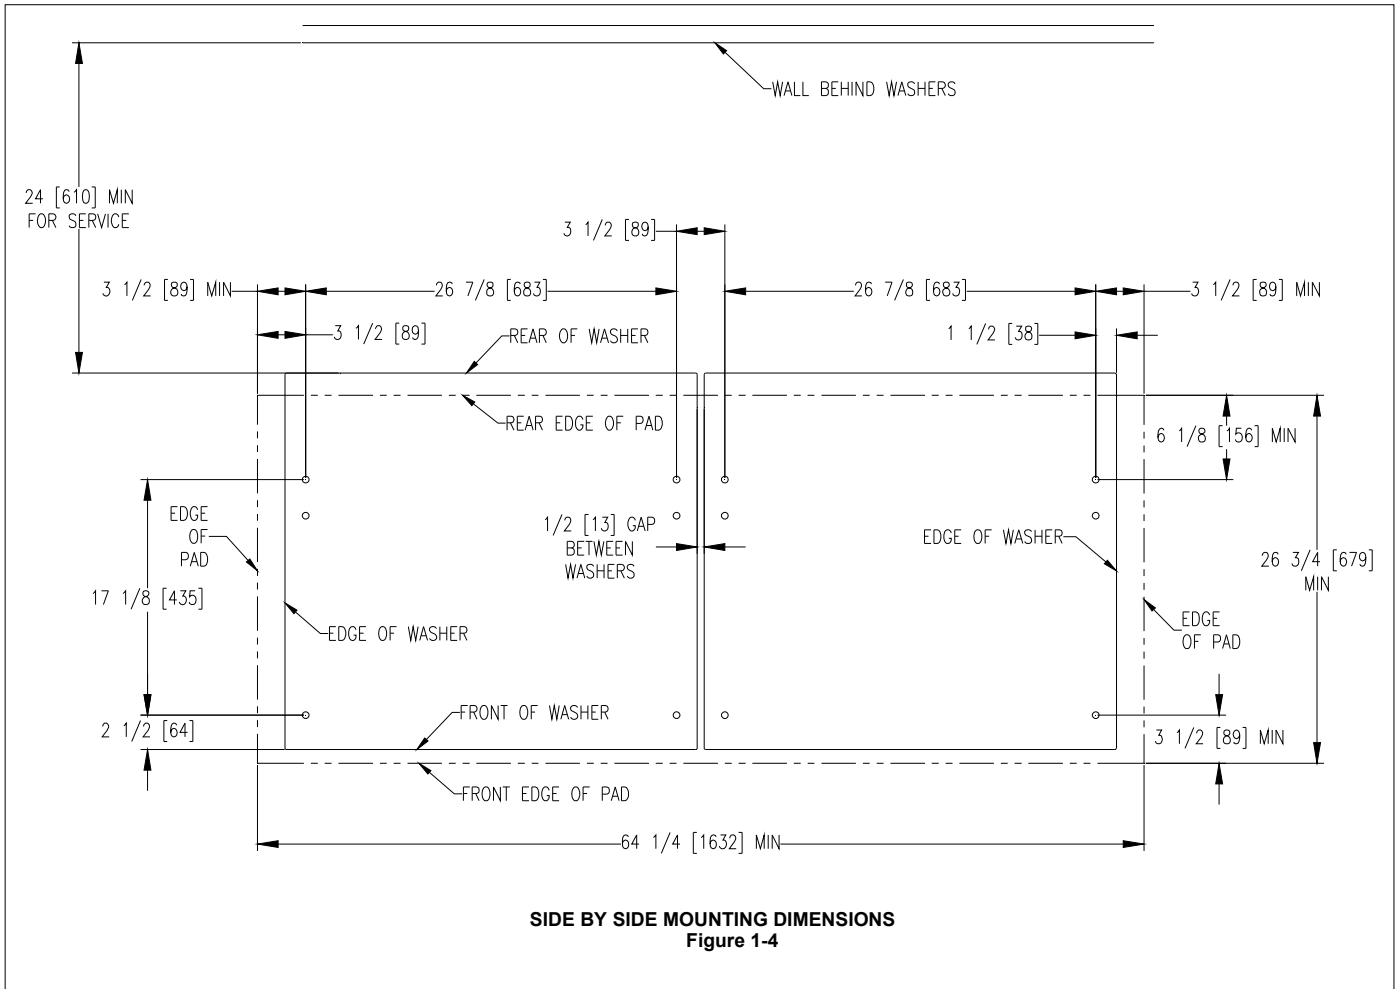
T-400 Machine Side By Side Mounting Detail
